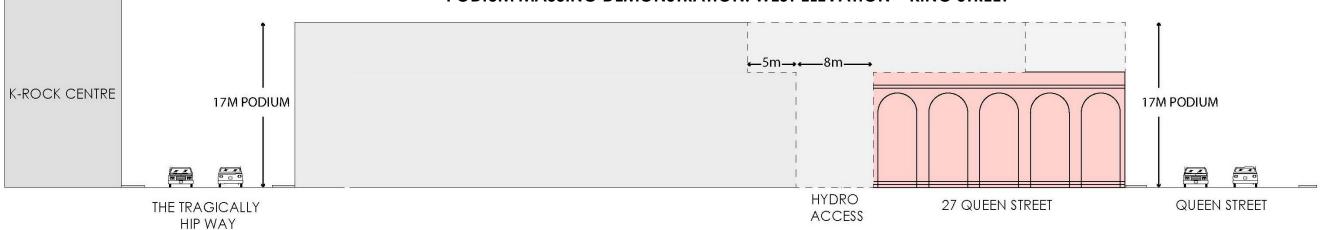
Podium elevation views showing required setbacks for new infill development adjacent to the existing heritage buildings on site.
